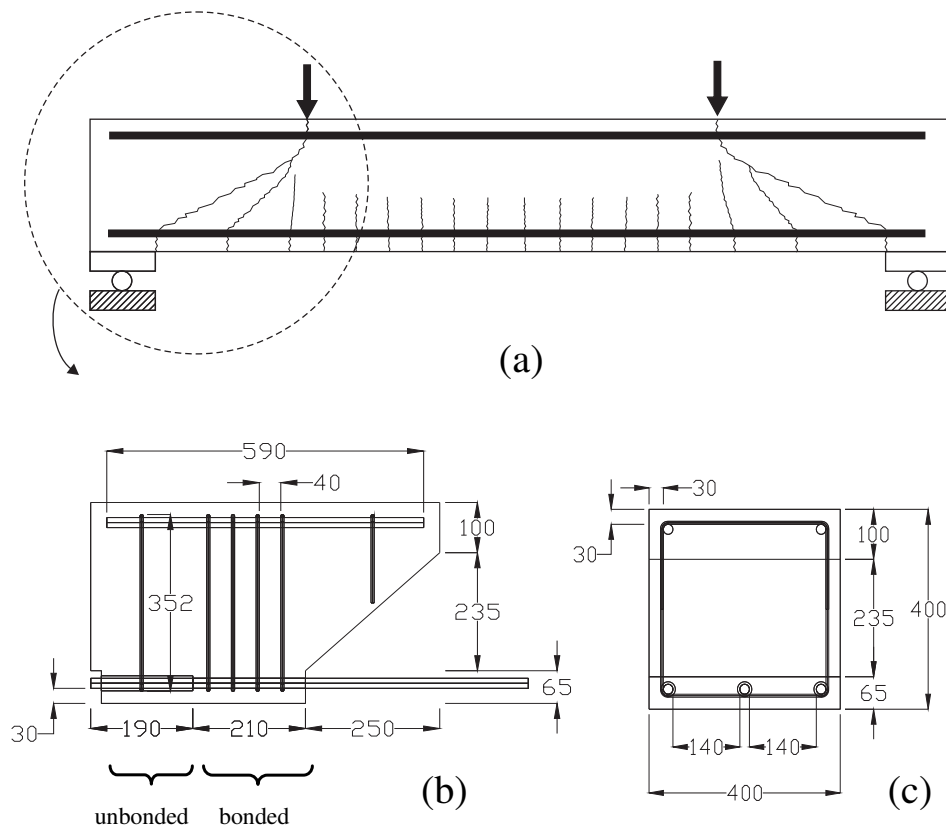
Test specimens: (a) schematic illustration of a beam end; (b-c) geometry and reinforcement for specimens types B and C; in type A the stirrups in the bonded length were removed. All dimensions are in mm.
